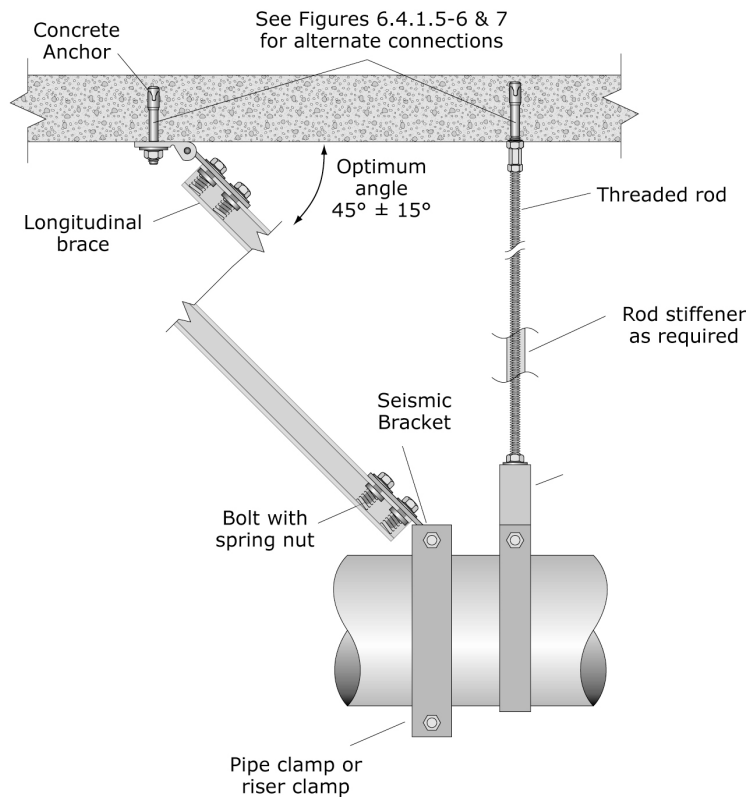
Rigid bracing - single pipe longitudinal (ER).
